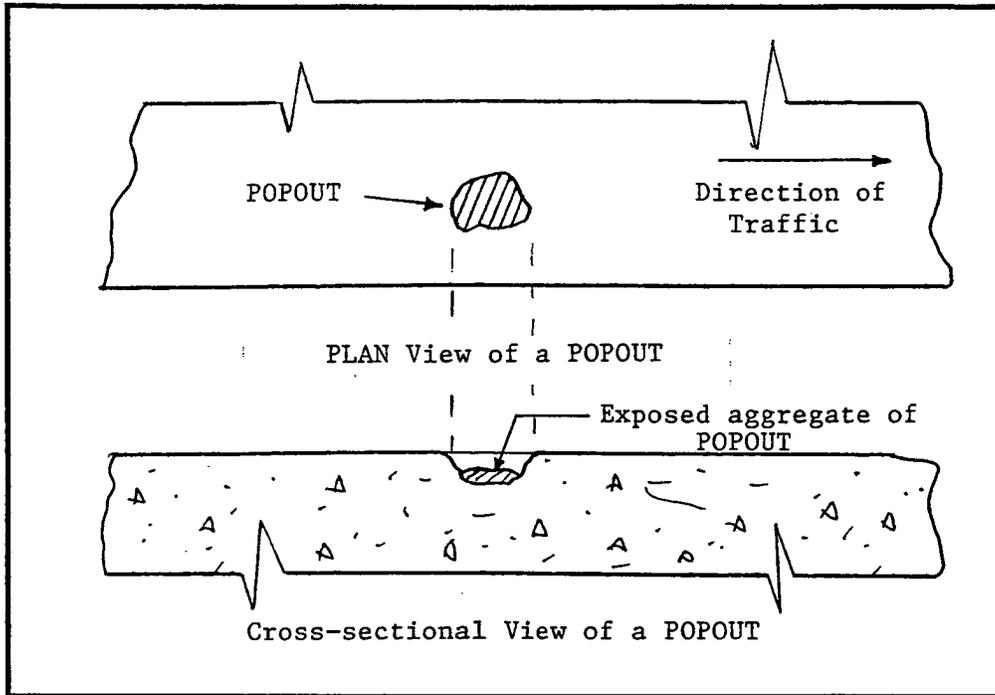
Popout in CRC Pavement, Plan and Cross-section Views
